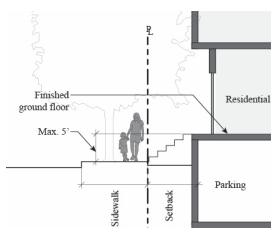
Finished ground floor elevation for residential developments within 5' of sidewalk.
